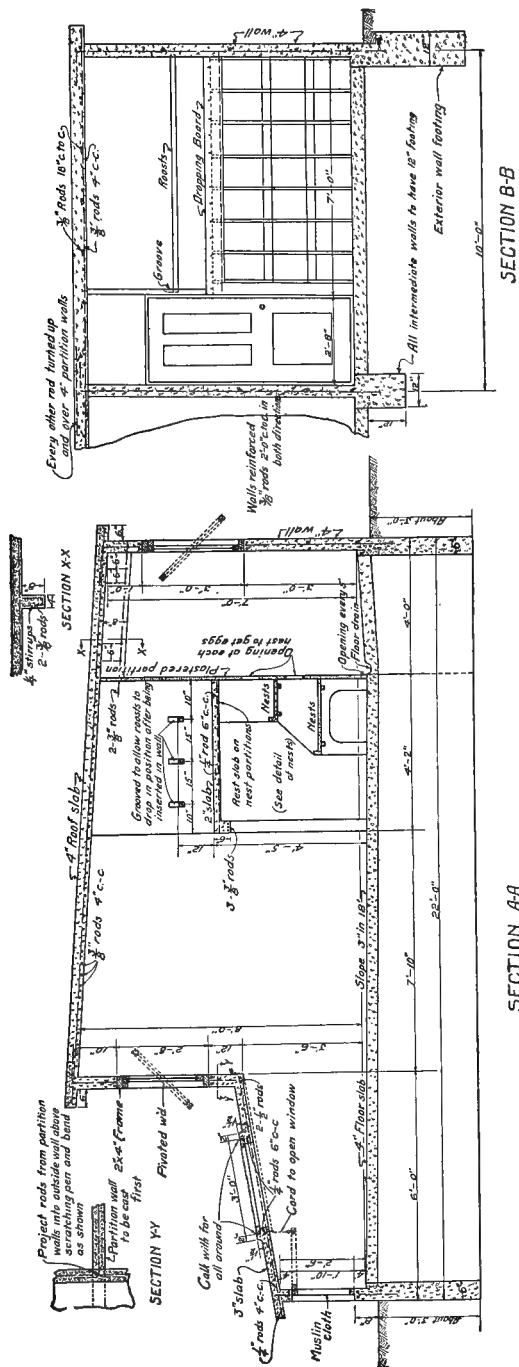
Sectional Views, Reinforced Concrete Poultry House.
